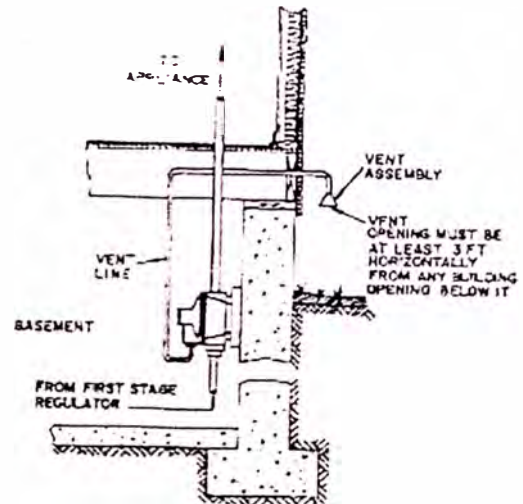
Typical Indoor Installation With Vent Line and Vent Assembly
